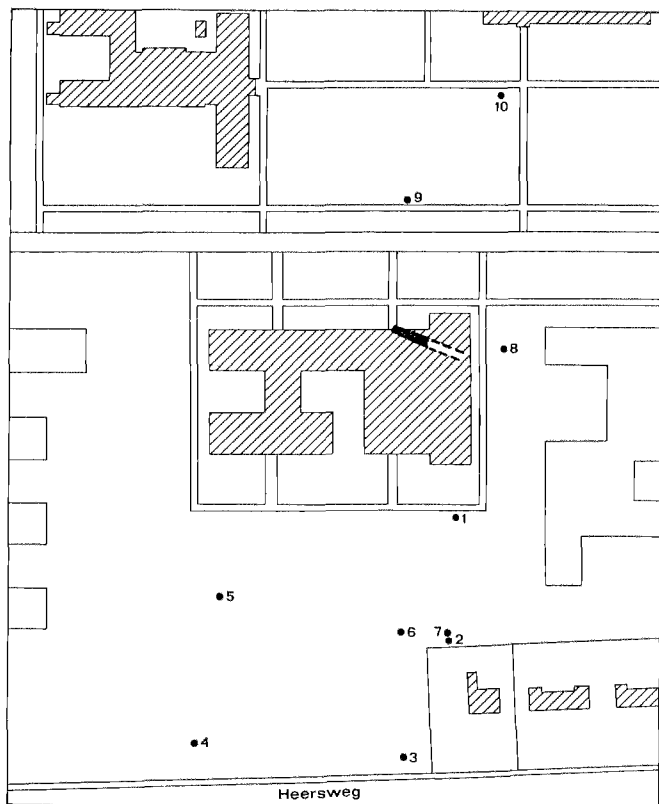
Situation of the barge in the construction-trench, location of borings, scale 1:2,500
